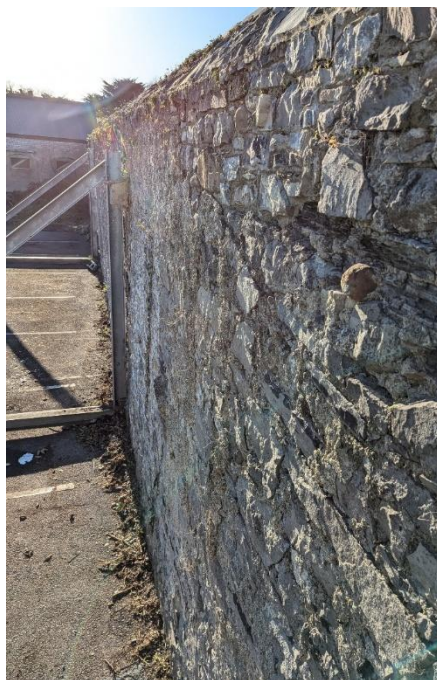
Bracing to Wall A as seen during wall inspection 26-11-2024 photos c/o HHC
